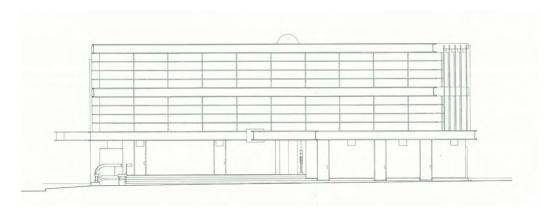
North Elevation showing horizontal louvres to the north, and vertical louvres wrapping around façade from western elevation. *Drawn Ted Quinton 2006.
